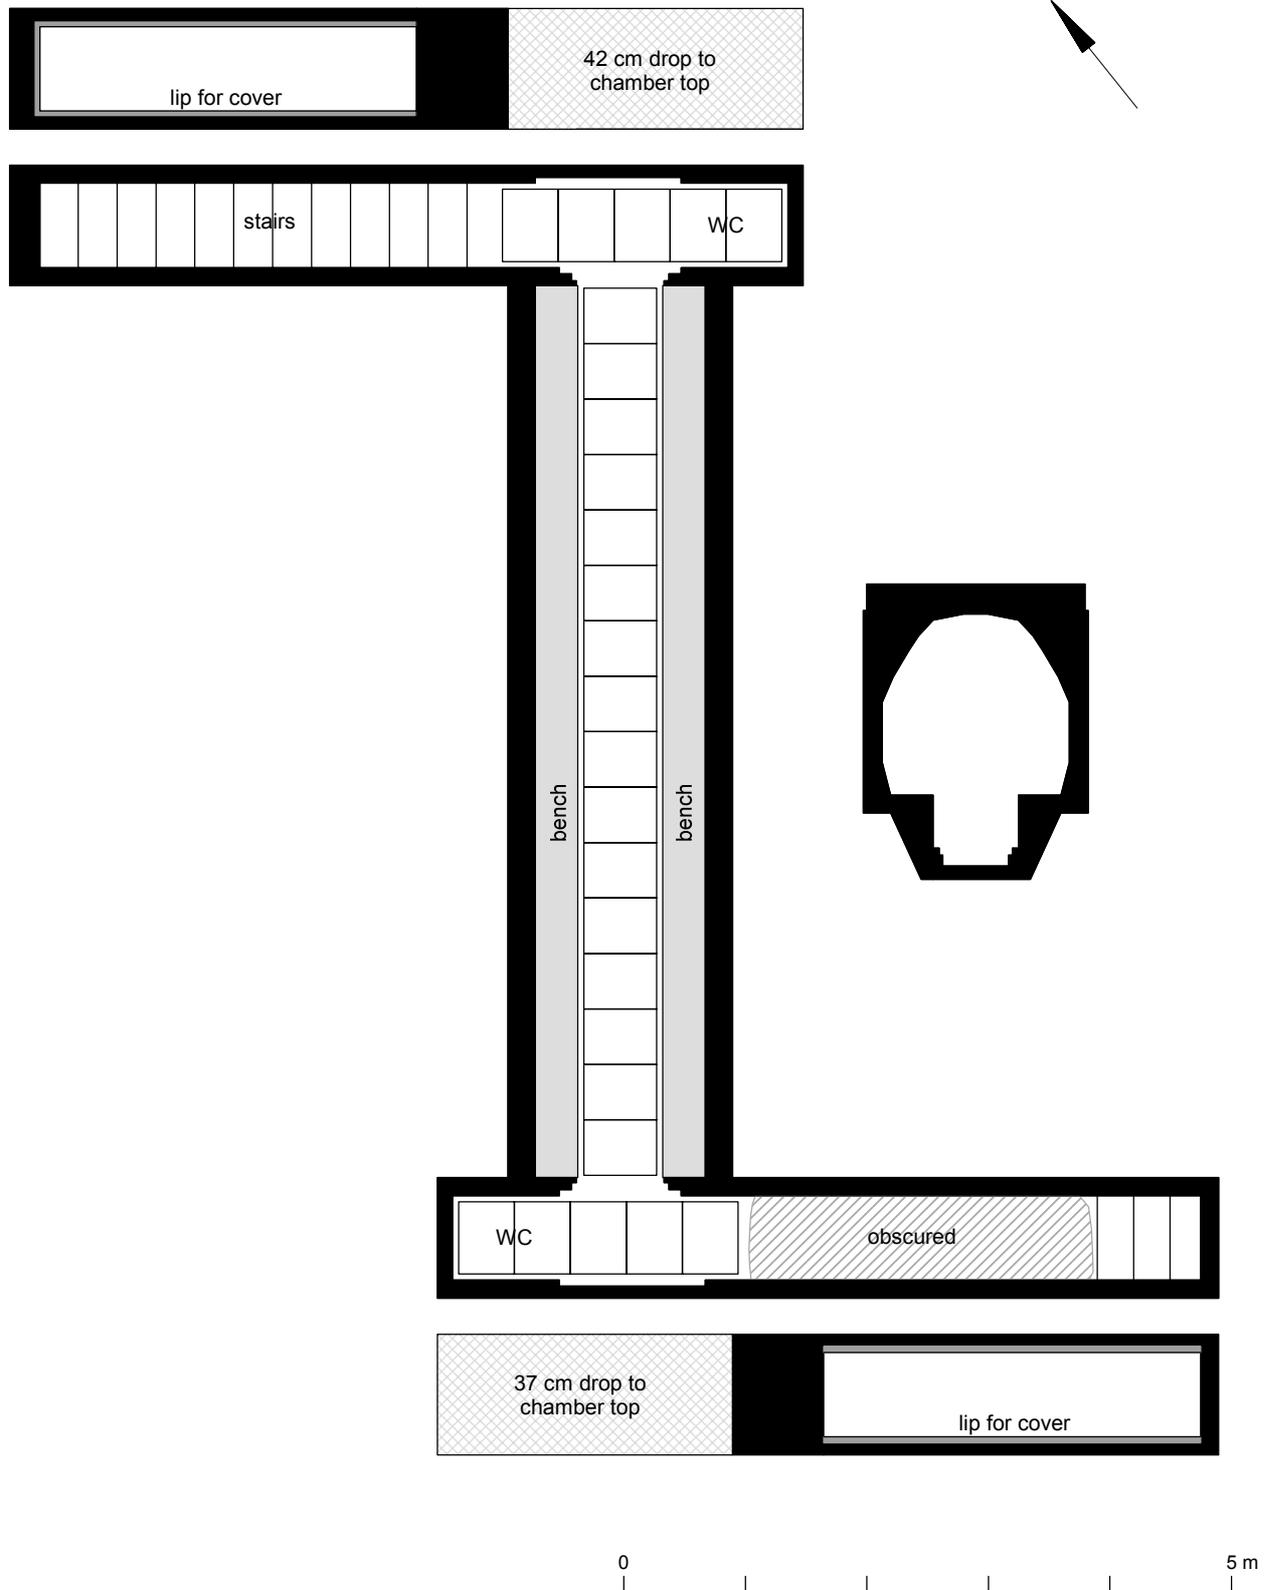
Area J1, air-raid shelter F4: internal plan and cross-section of chamber.
